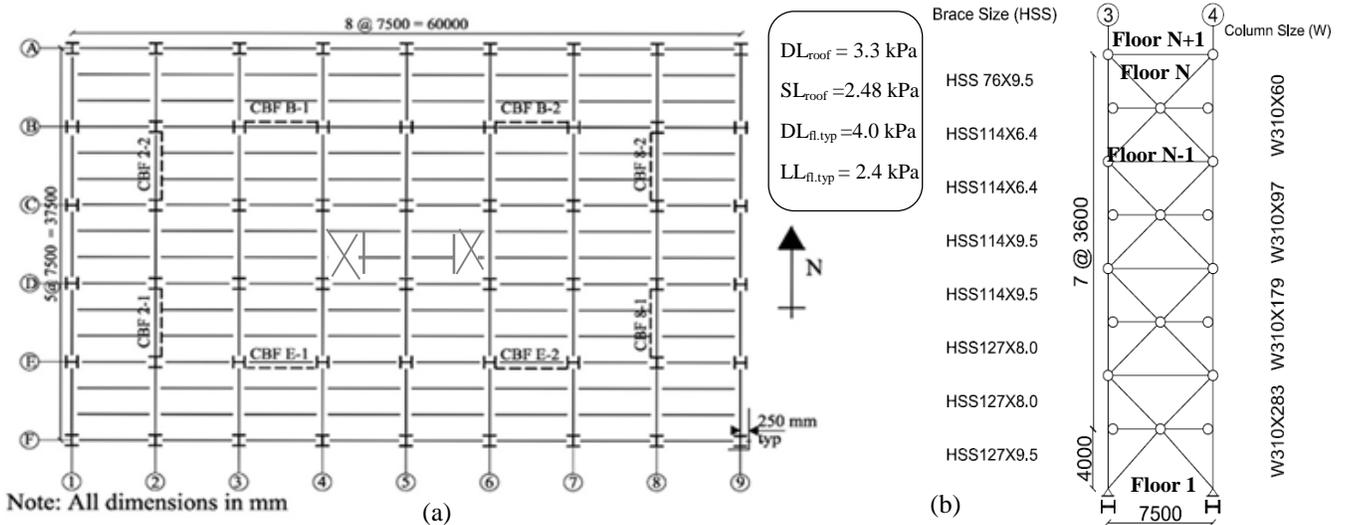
Building studied: a) floor plan and b) CBF1 elevation
